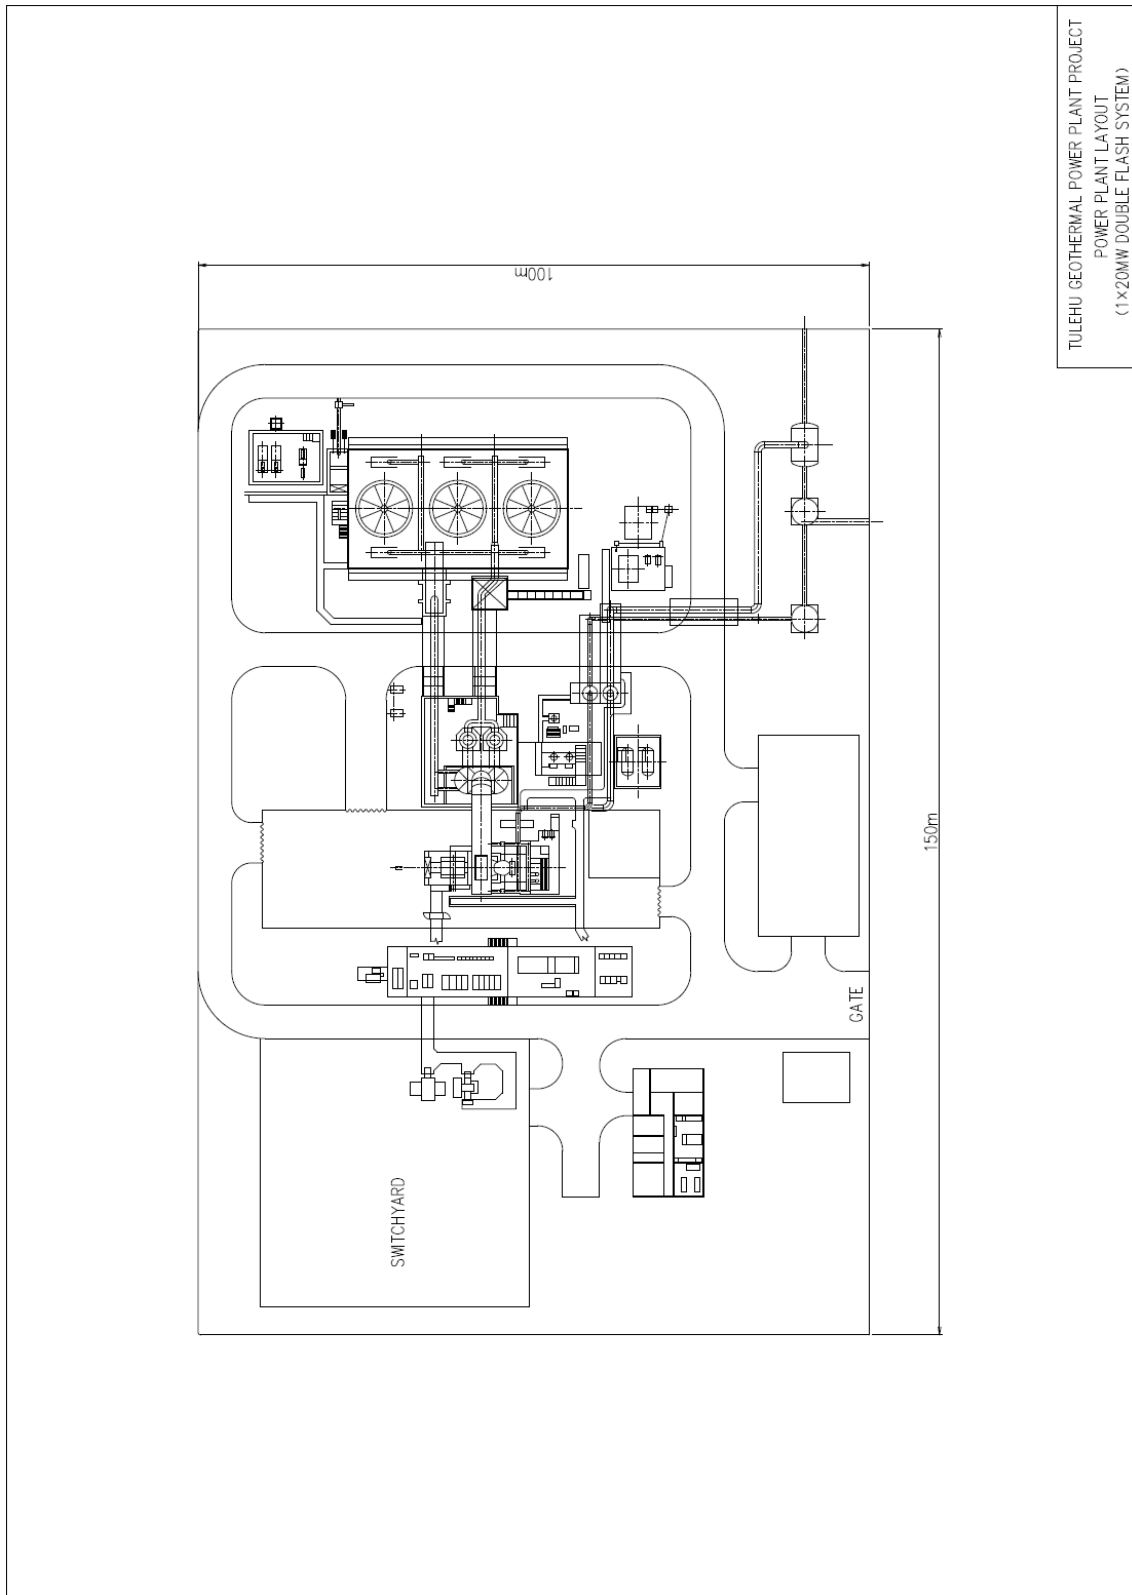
Power Plant Layout (1 x 20 MW Double Flash System)
